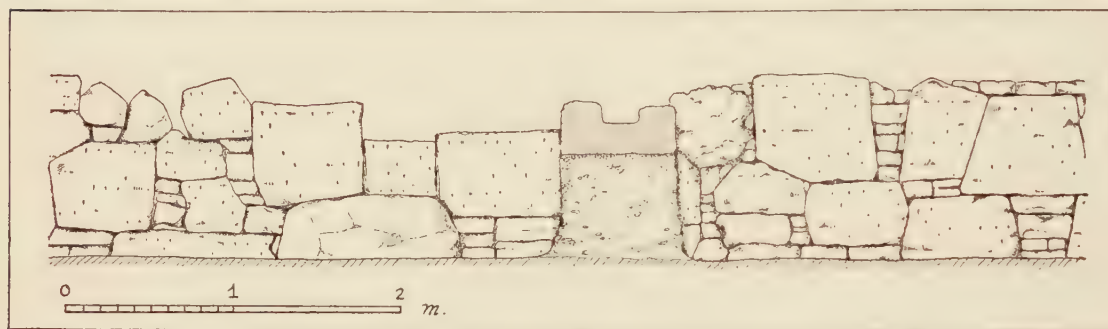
House B: East Wall, Elevation, and Poros Channel Block of Second Period in Section.
